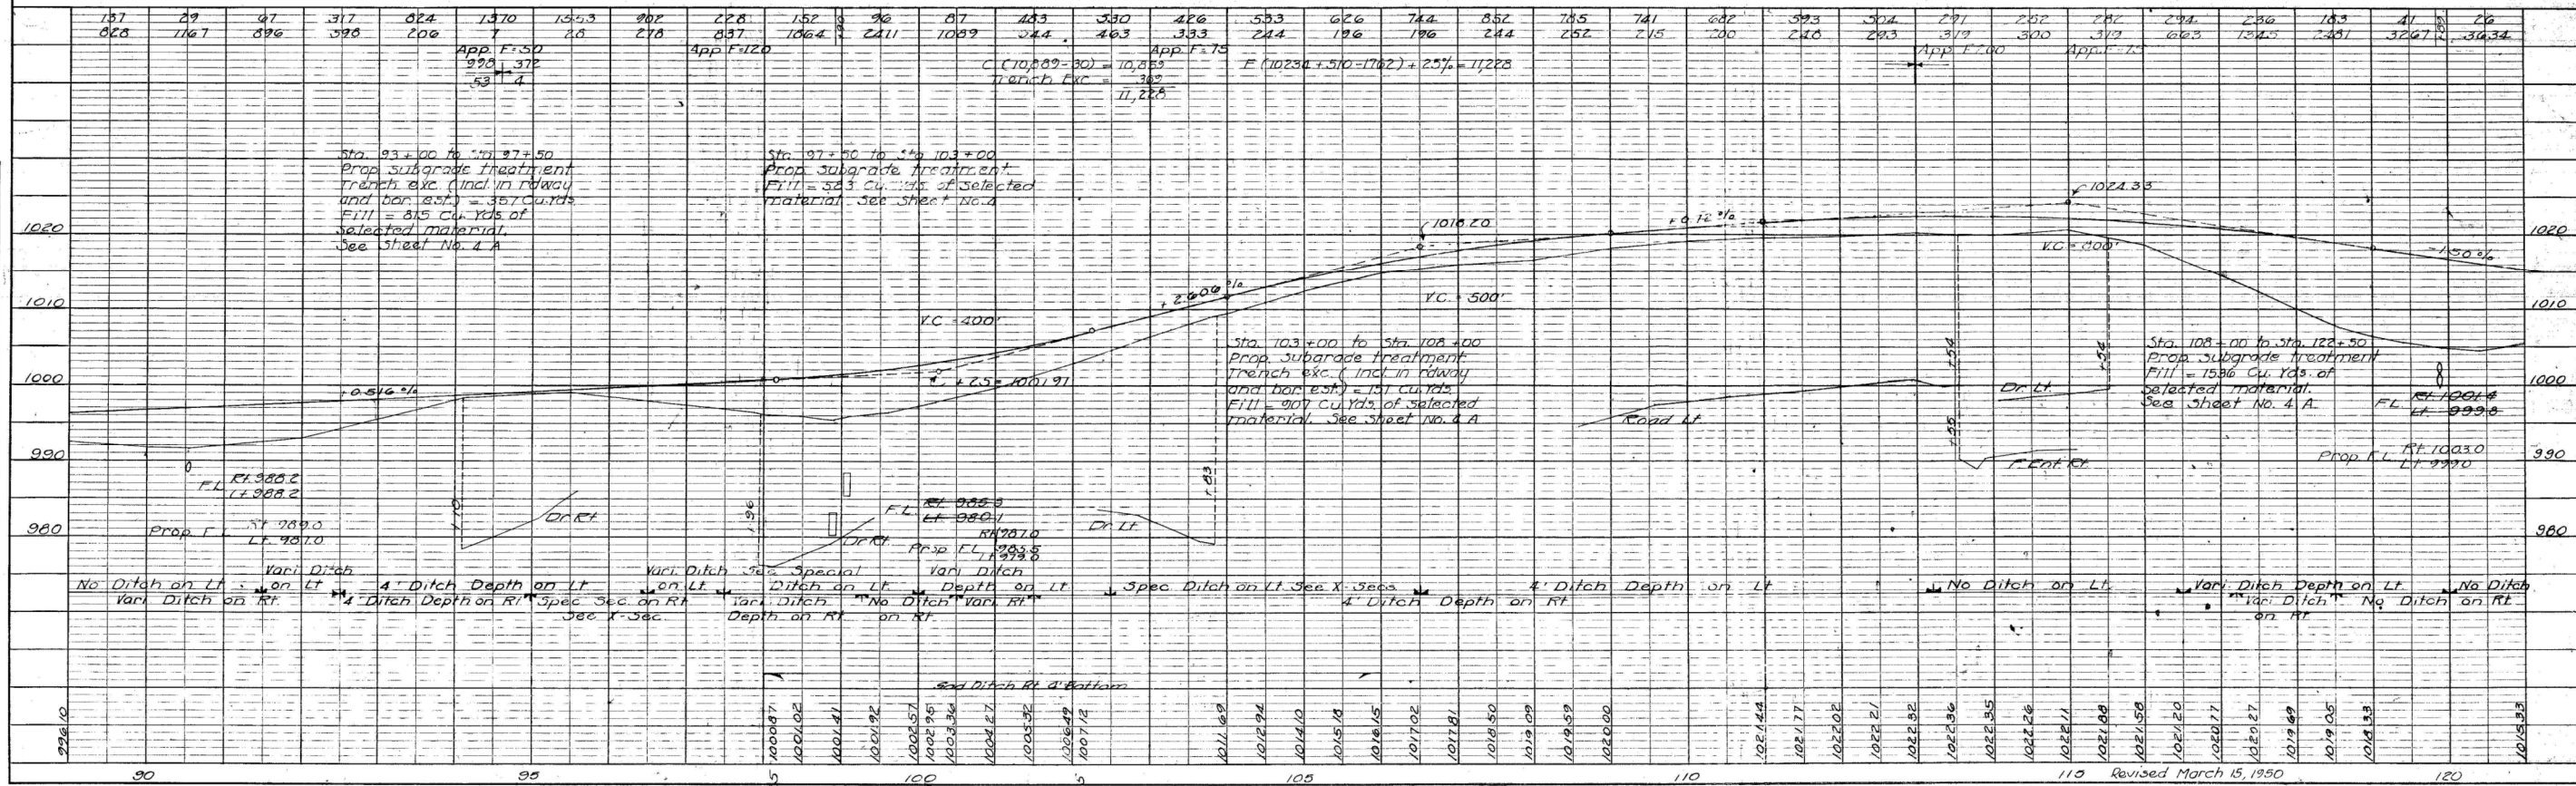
PLAN - PROFILE O.F.R. & E. STANDARD
